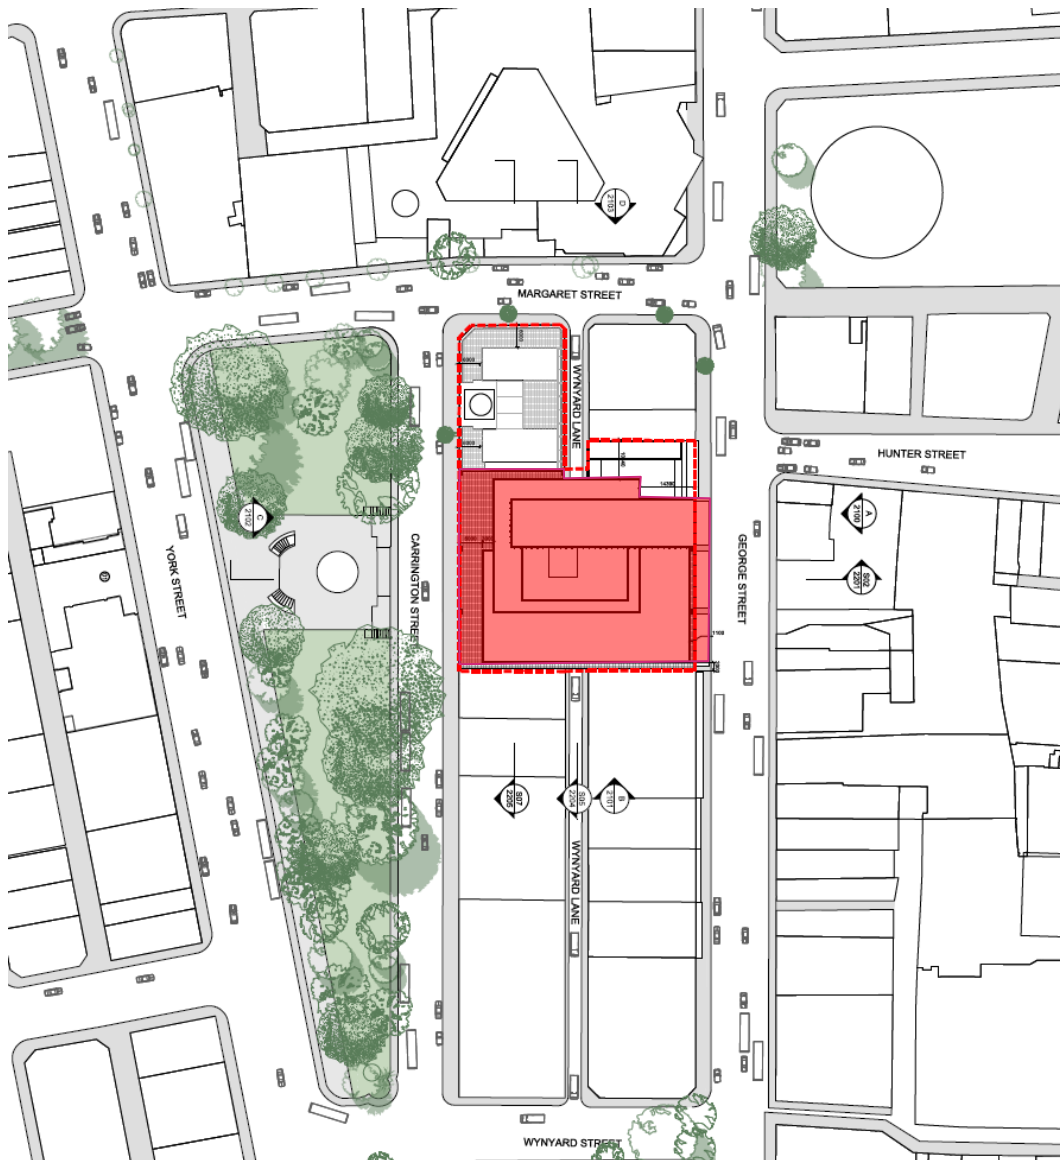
Site plan. New building highlighted in red (plan by Make + Architectus)
